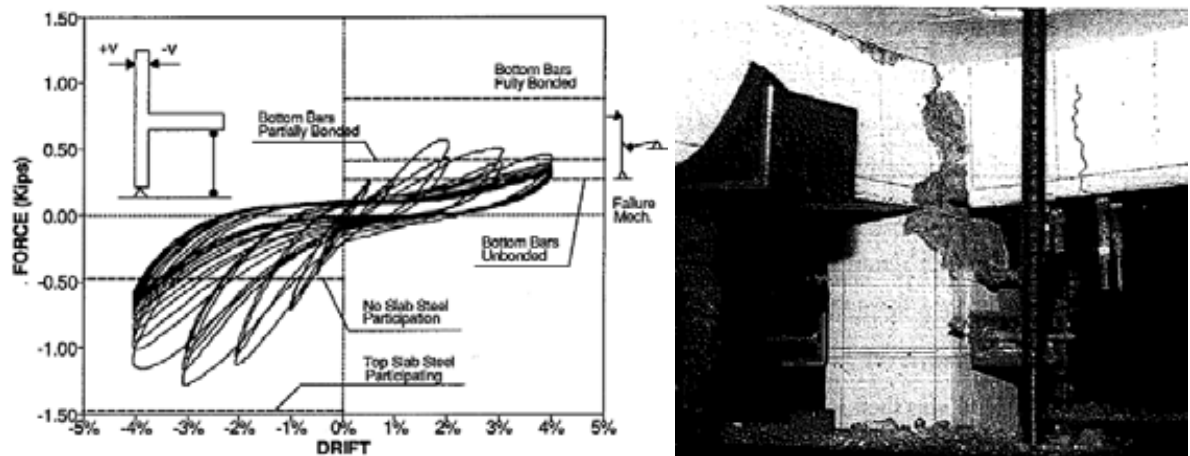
Non-ductile RC exterior beam-column joint with transverse beam and floor slab: Load displacement plot and damage pattern indicating joint damage and beam anchorage failure [17].
